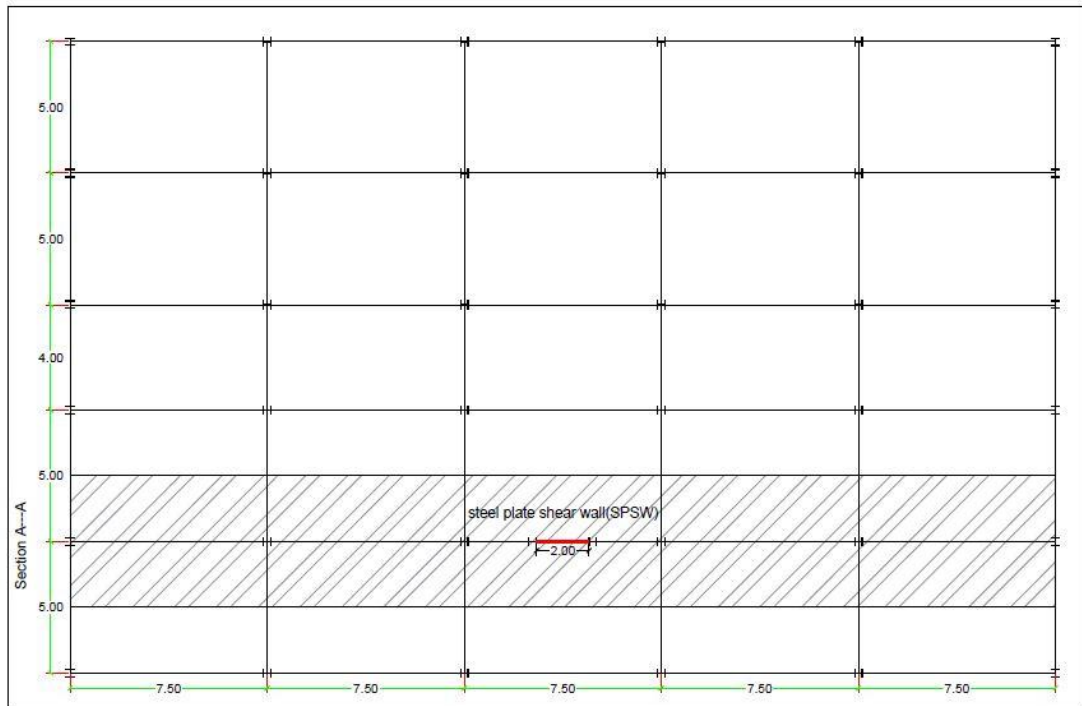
Plan of 4-story building with steel plate shear walls having aspect ratio of 0.570 (Model 2)
